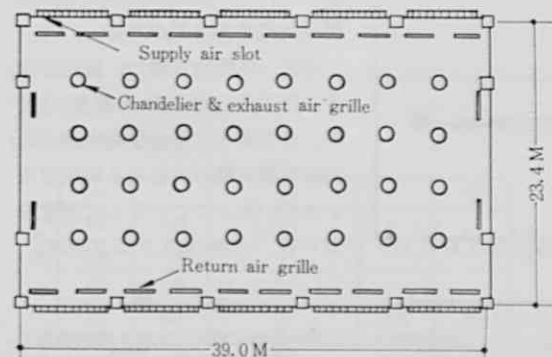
Location of Chandeliers, Slots and Grilles in the Assembly Hall
